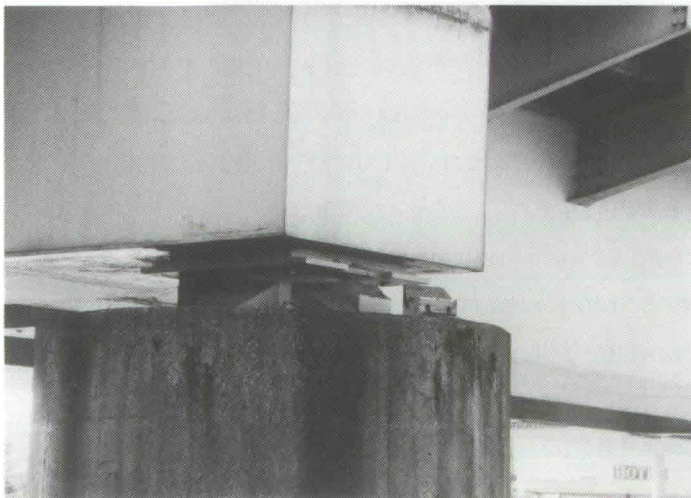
Failure of lower shoes on transverse box girders on a steel girder bridge (Ikawa River Bridge, Sanyo Bullet Train Line)
